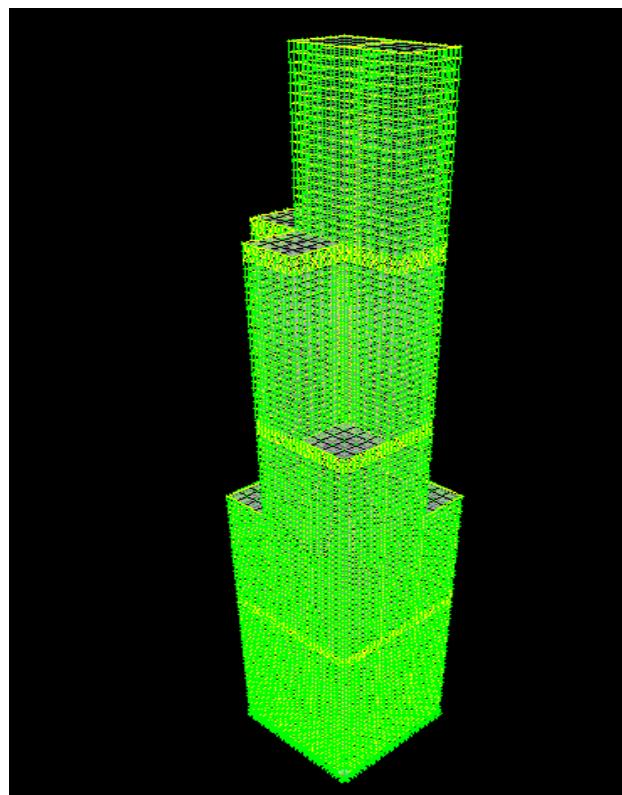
3-D view of steel bundled tube structure with belt truss.
